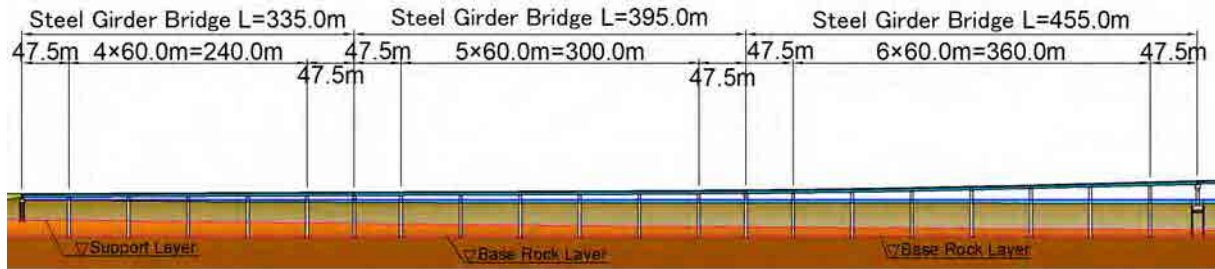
Layout of the Left Bank Approach Bridge (Route2)
